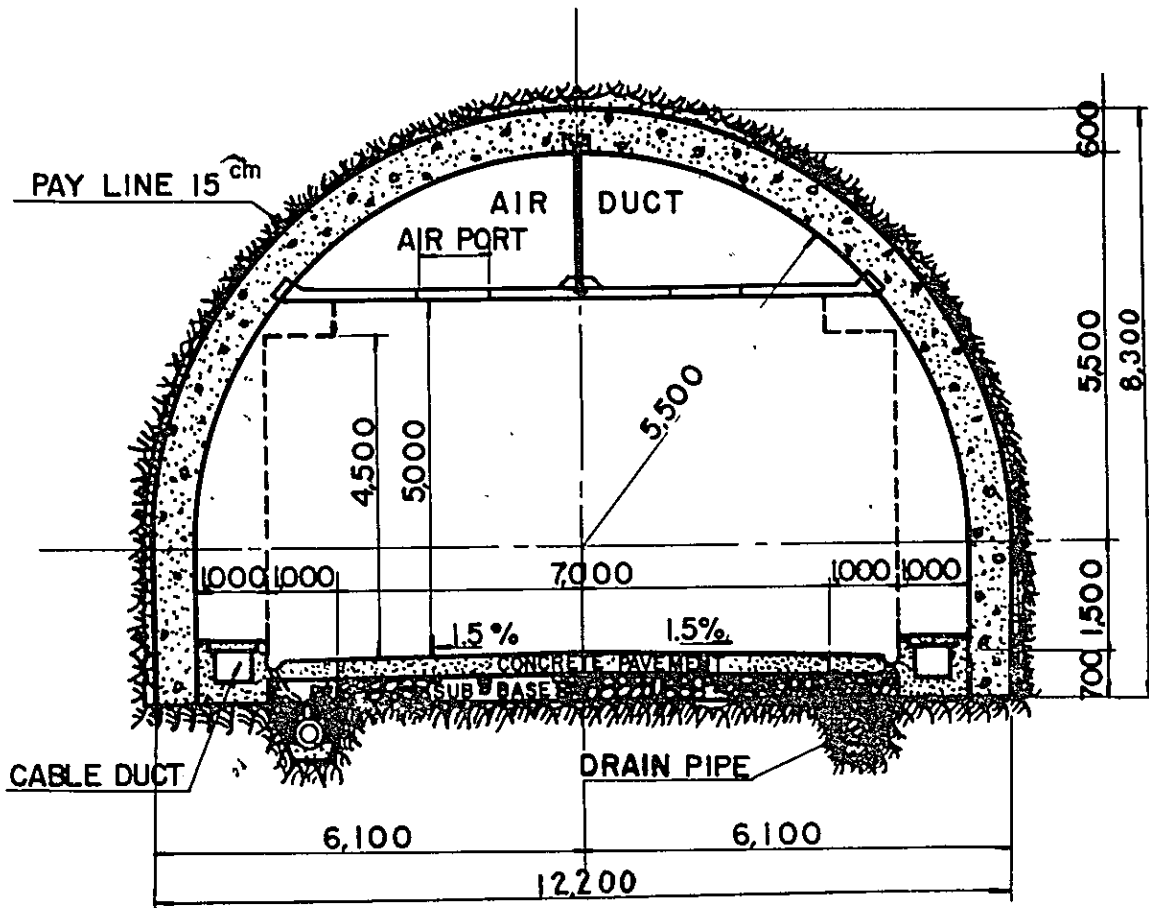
REVISED PLAN FOR 3-SHAFTS
